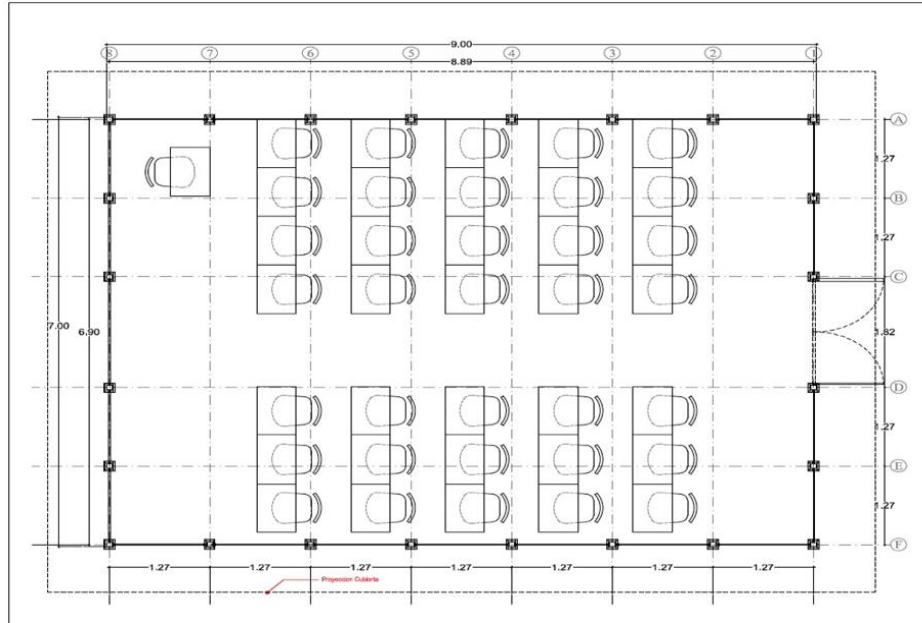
Solar classroom floor plan view, Lérída, Tolima
